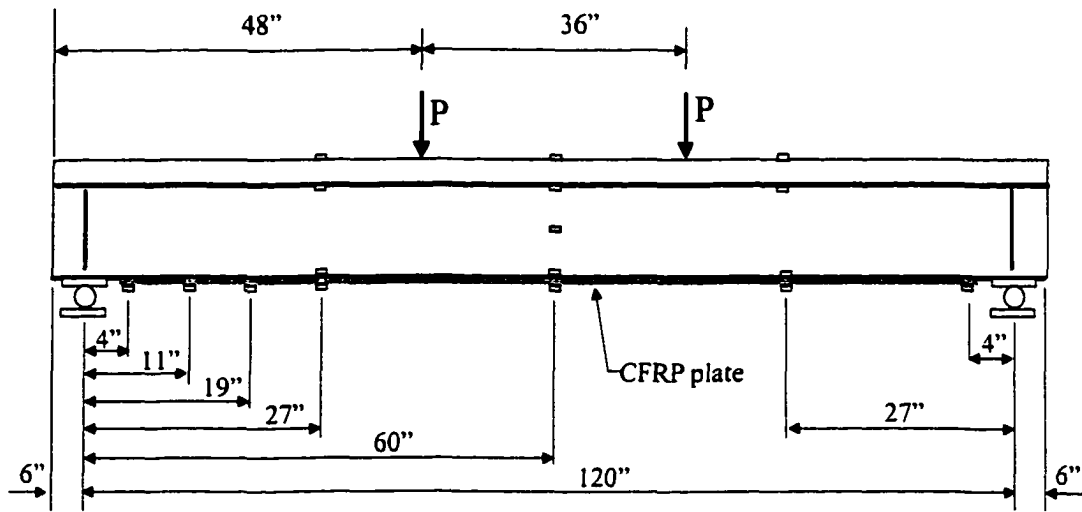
Locations of Celescos and DCDT's on a typical beam specimen.
